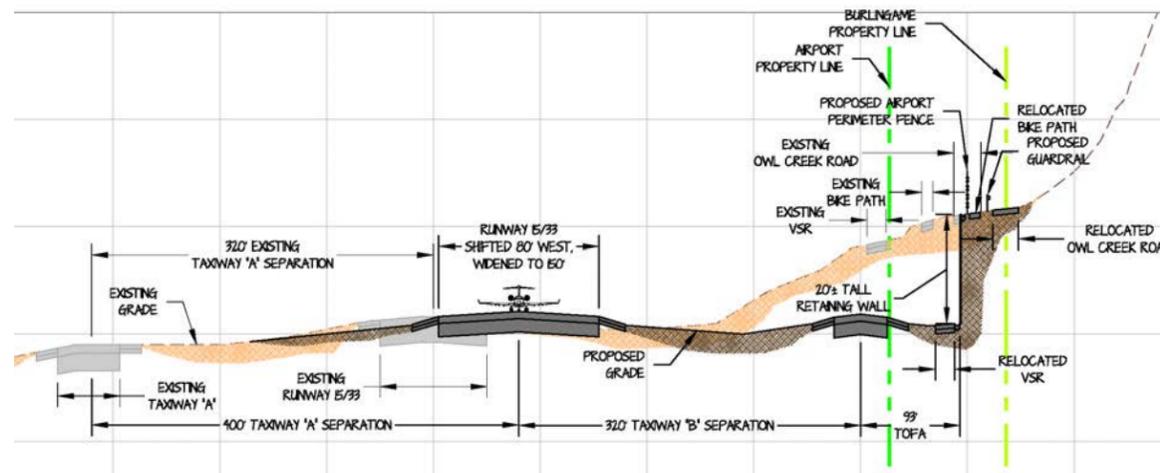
Location of West Side Pinch Point Cross Section (Typical)
